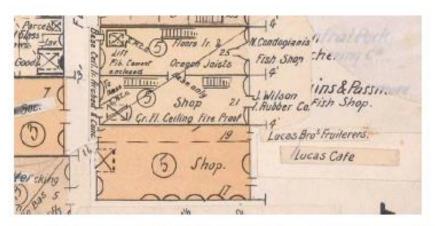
Section from 1910 City of Melbourne Detail Fire Survey Plan by Mahistedt shows the subject building with an enclosed fibro-cement lift with single metal clad doors, Iron floors and Oregon joists, as well as an internal opening connection no 25 with no 21-23 next door. (Source: Mahisted Map, no 15, 1910)
